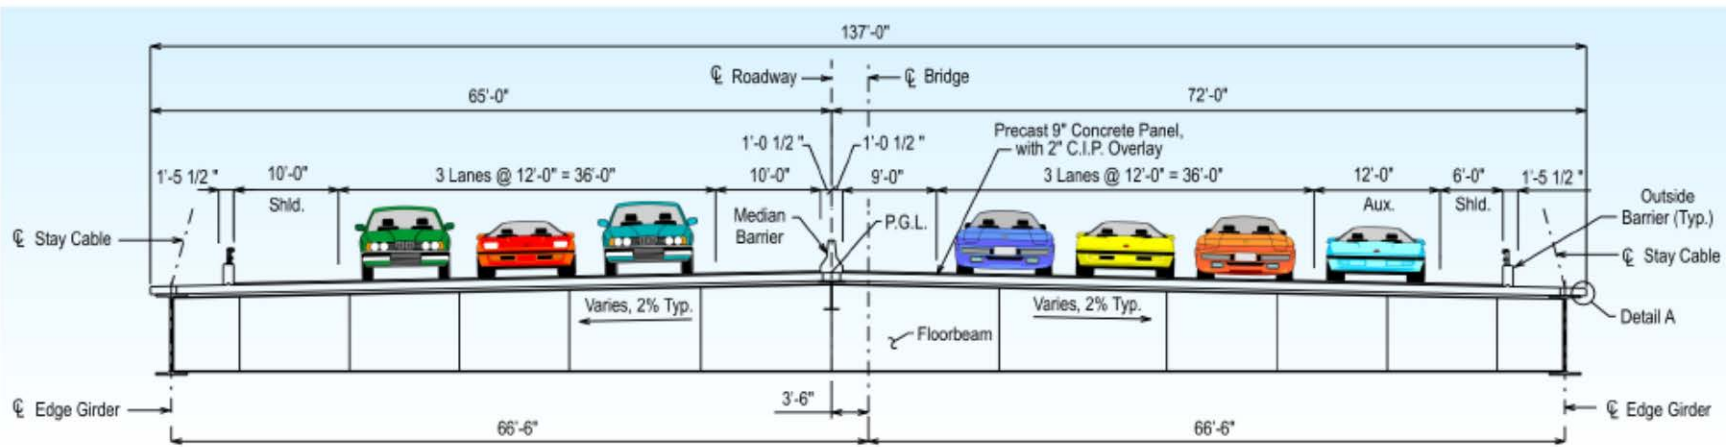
New element: proposed cross section of the new Missouri River bridge to replace the existing four-lane (no shoulders) Paseo Bridge.
